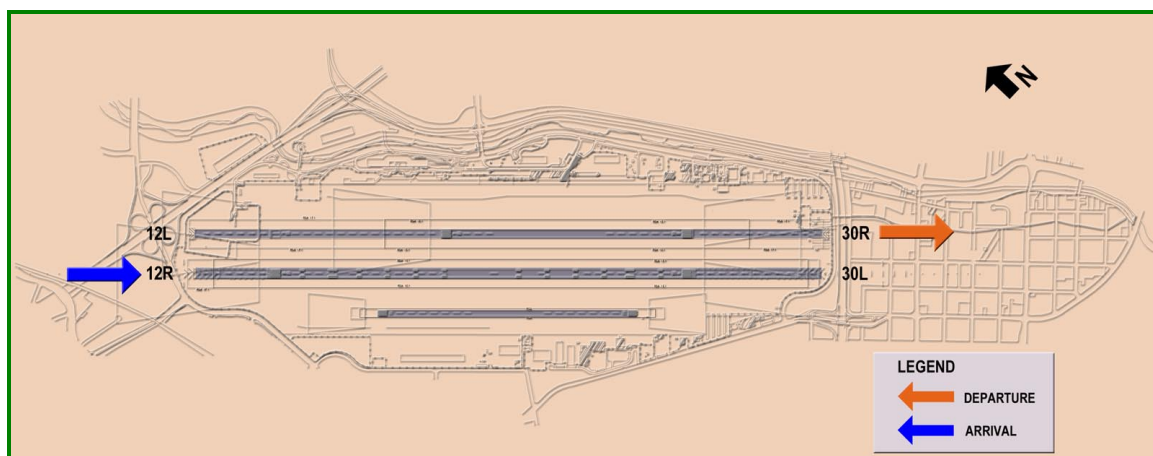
SJC Dual Runway Southeast Plan Alternative
